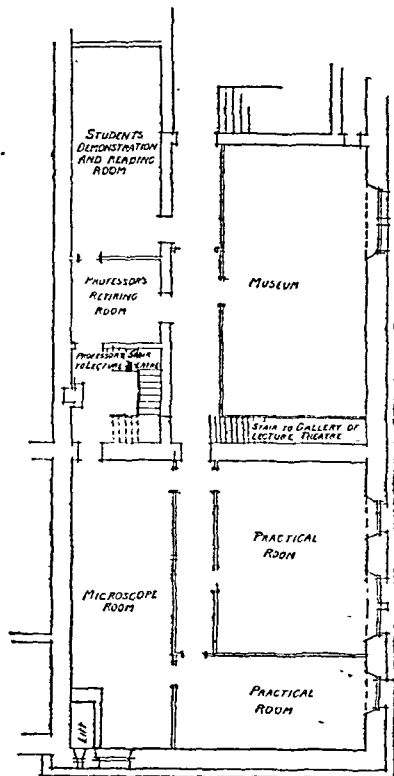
Teaching Department: Plan of intermediate floor below Surgical Lecture Theatre (see Fig. 3).
